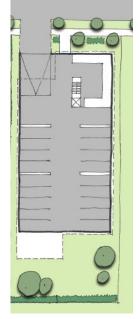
b - plan of preferred underground car parking locations in Precinct 3
